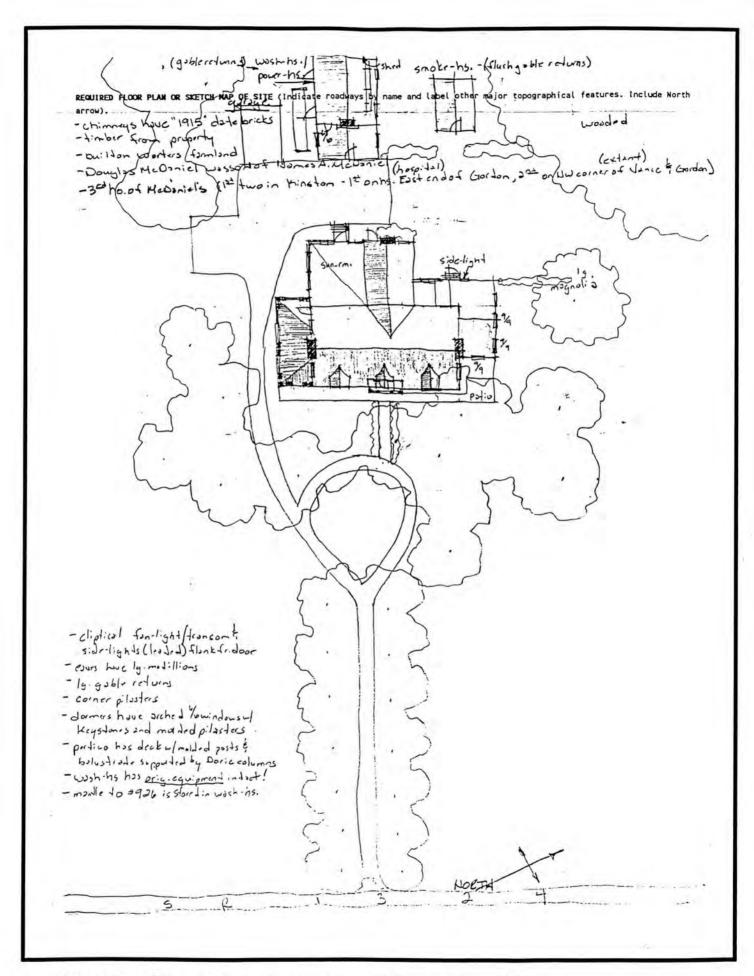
James Alexander and Laura McDaniel House (#39) - site plan drawn by Robbie D. Jones in 1974
